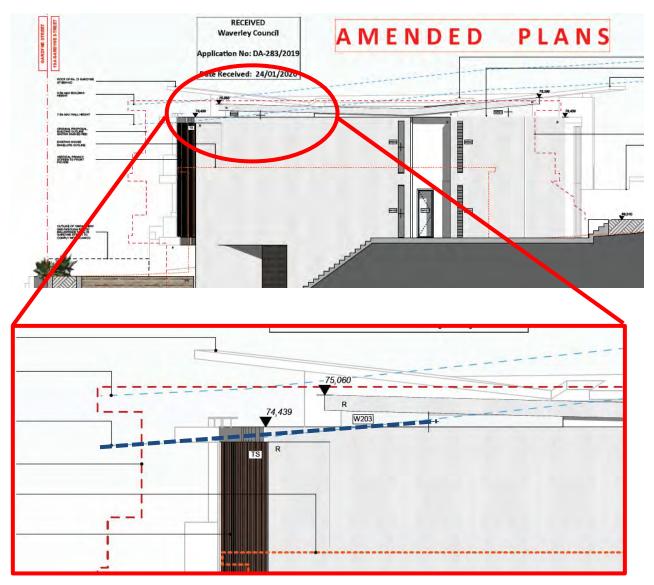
Wall height exceedance to western elevation (dashed in dark blue).
